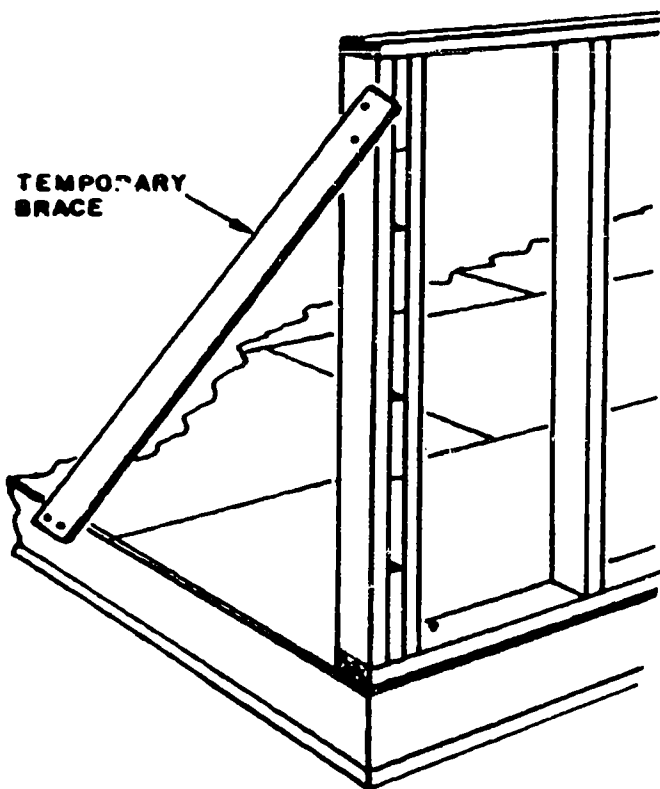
A Wall Frame Assembled on the Floor, Then Raised into Place
